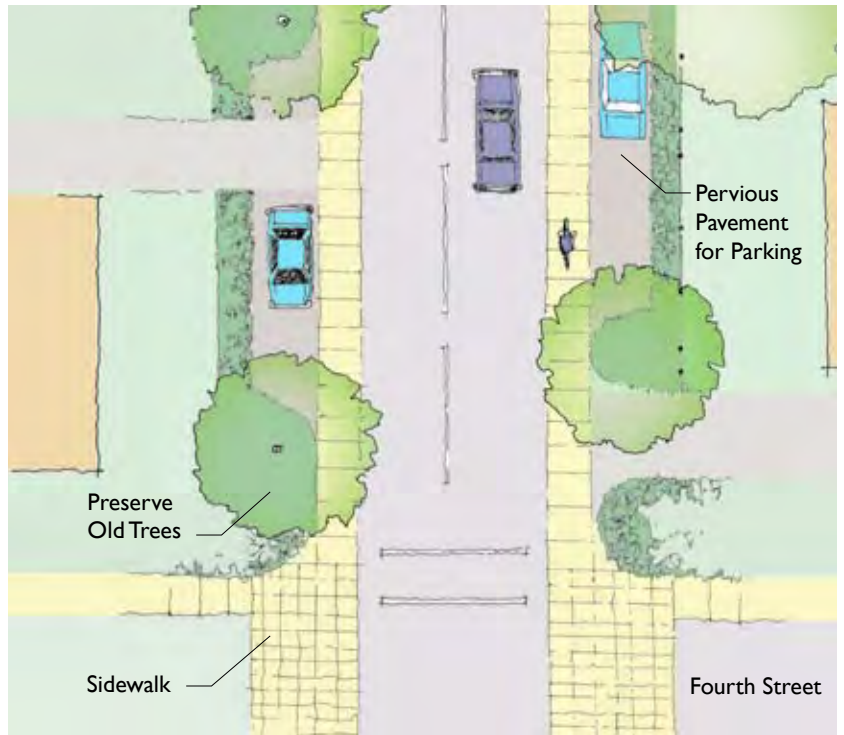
Enlarged Plan with On-Grade Sidewalks, No Bike Lanes and Casual Parking
